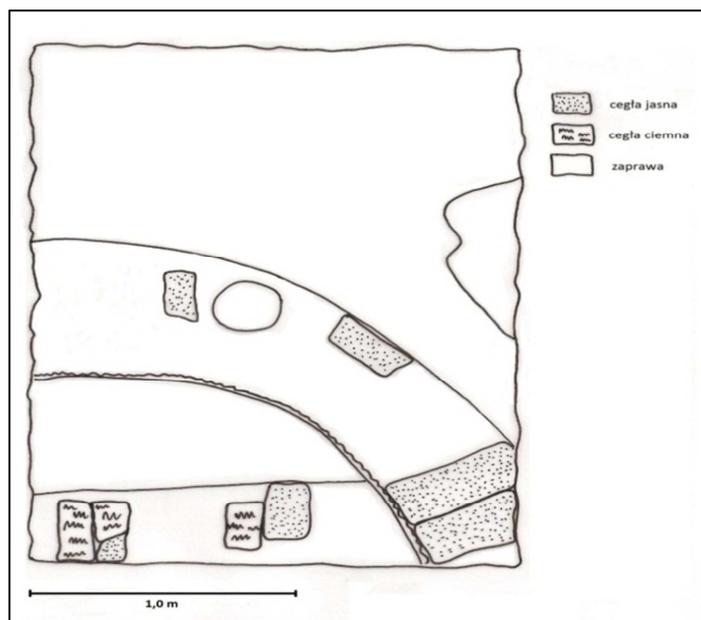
A draft of bricks' arrangement (plan) from the third fragment of a wall. (Cegła jasna- light brick, cegła ciemna – dark brick, zaprawa- daub)
